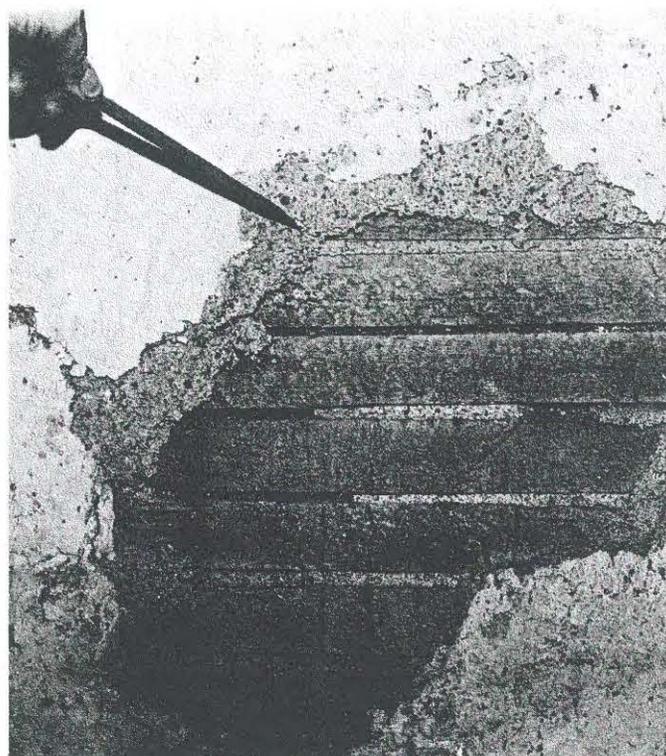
Too much aggregate (sand) and not enough cementing material (lime or gypsum) in the base coat has made this plaster surface weak and crumbly. Besides losing its key with the lath, the layers are disintegrating. It will most likely need to be totally removed and replaced with all new plaster. Photo: Marylee MacDonald.
